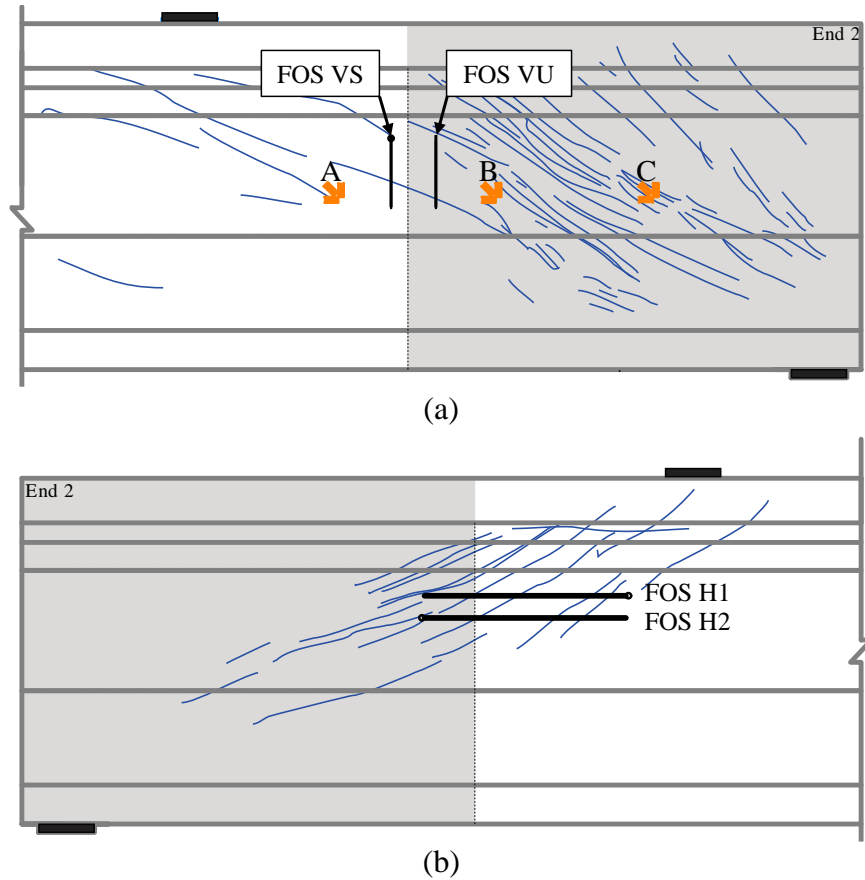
Crack patterns at final load on (a) front face and (b) back face
